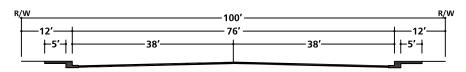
CITY OF ONTARIO GENERAL PLAN ROADWAY CROSS-SECTIONS
